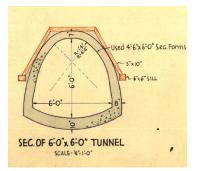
Parabolic or semielliptical shaped emergency tunnel. Segment 4-TUN-6, constructed 1939-1940.
